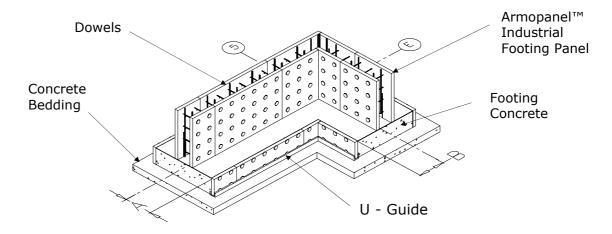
Detail Footings are made from Armopanel™ Industrial Foundation panels
